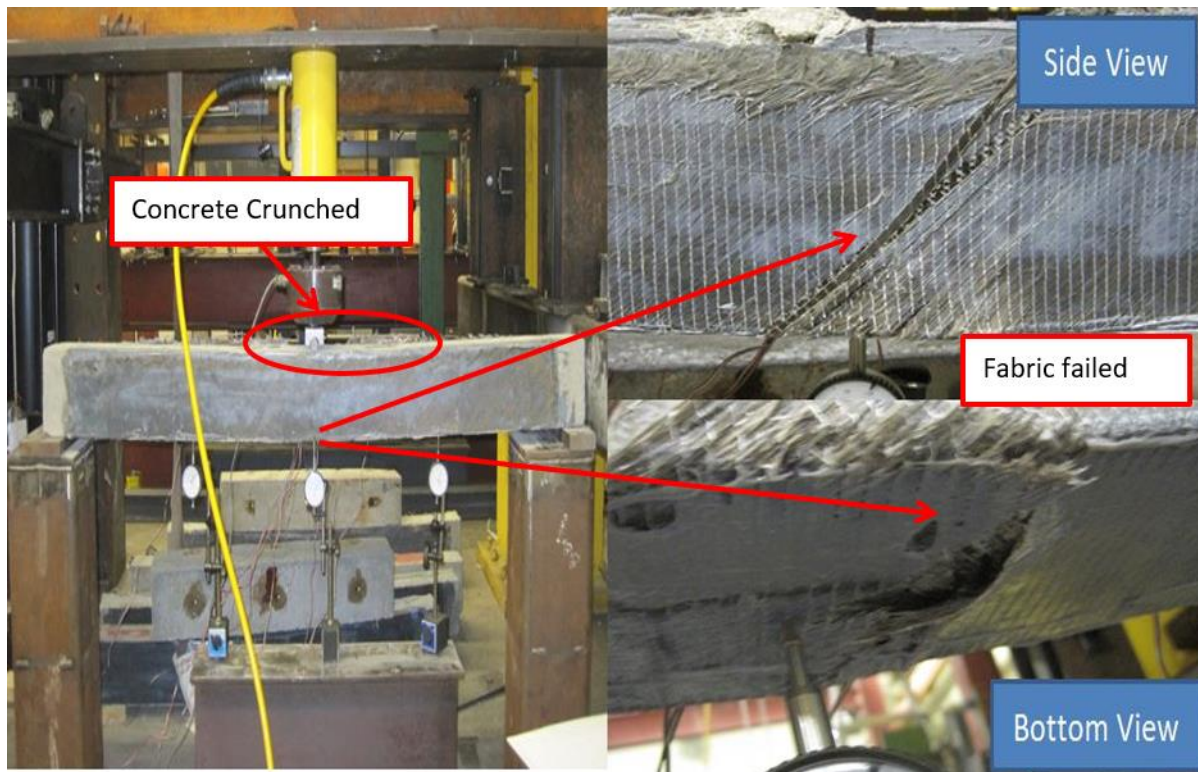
Crack Pattern of Specimen B-1 (retrofitted)
